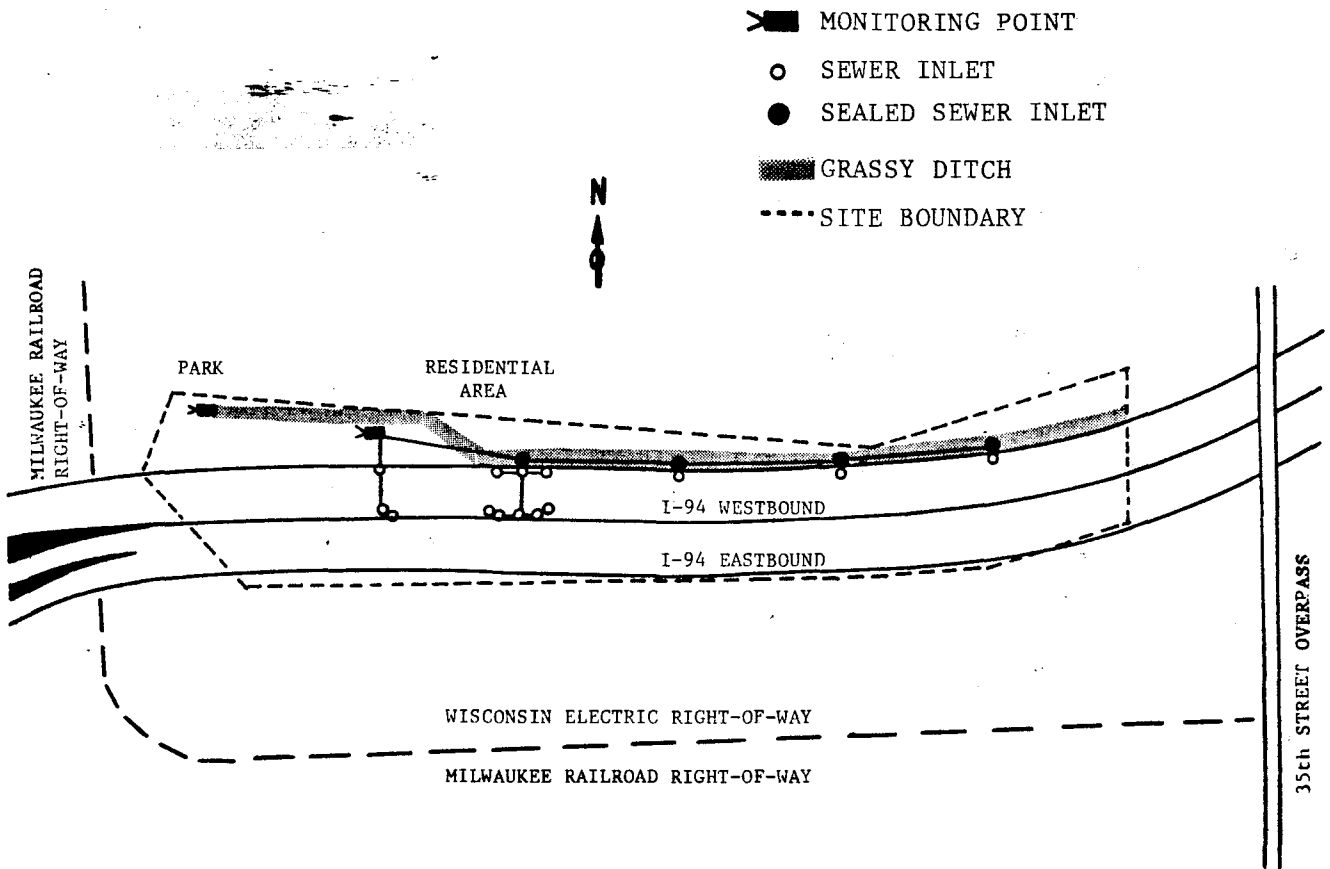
Schematic drainage plan - Milwaukee I-94 site.
